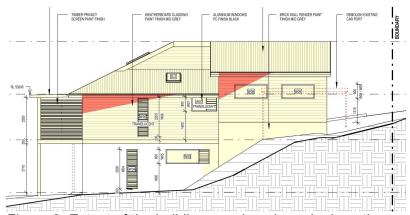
Extent of the building envelope breach along the southern elevation shaded red.
